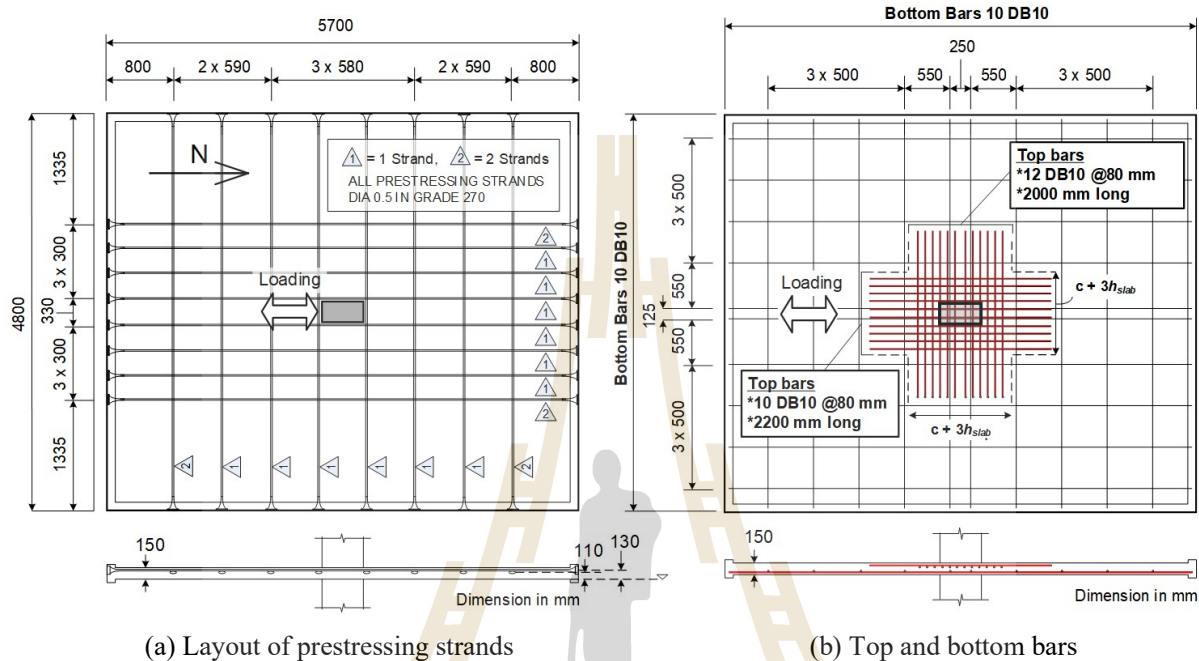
Layout of prestressing strands, and supplementary reinforcements in slabs of both specimens
